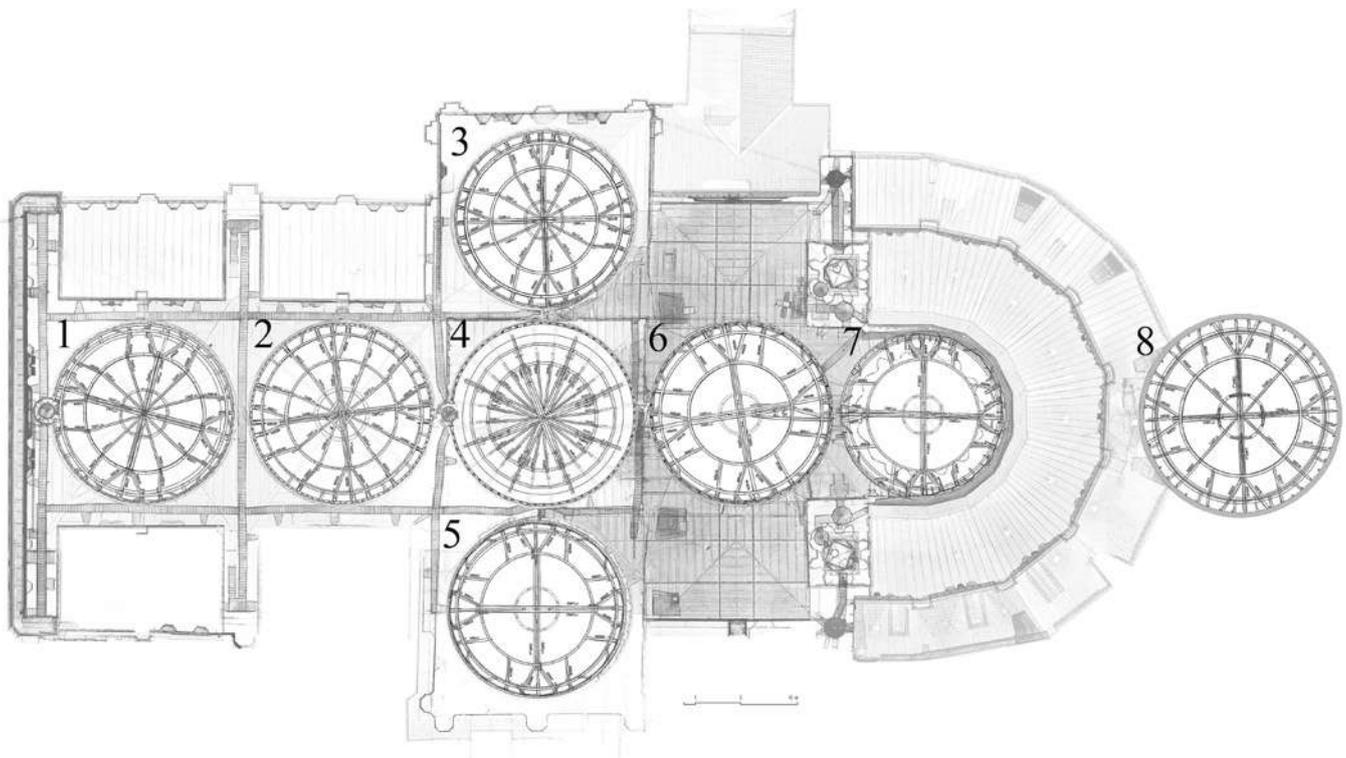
Attics plan of the St. Anthony Basilica: (1) façade dome; (2) intermediate dome; (3) St. Anthony dome; (4) angel cone; (5) St. Jacob dome; (6) presbytery dome; (7) choir dome; (8) relics dome.
